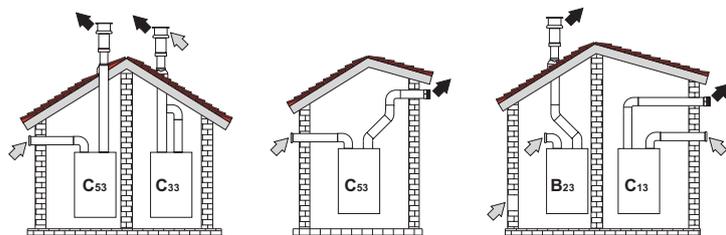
Examples of connection with separate pipes (⇨ = Air / ⇨ = Fumes)
